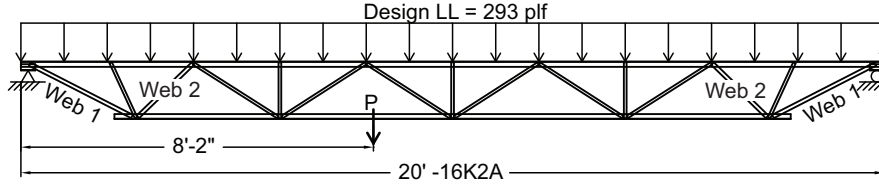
Overall steel joist with applied loads. Web members without a cross-section label are all Web 3.
